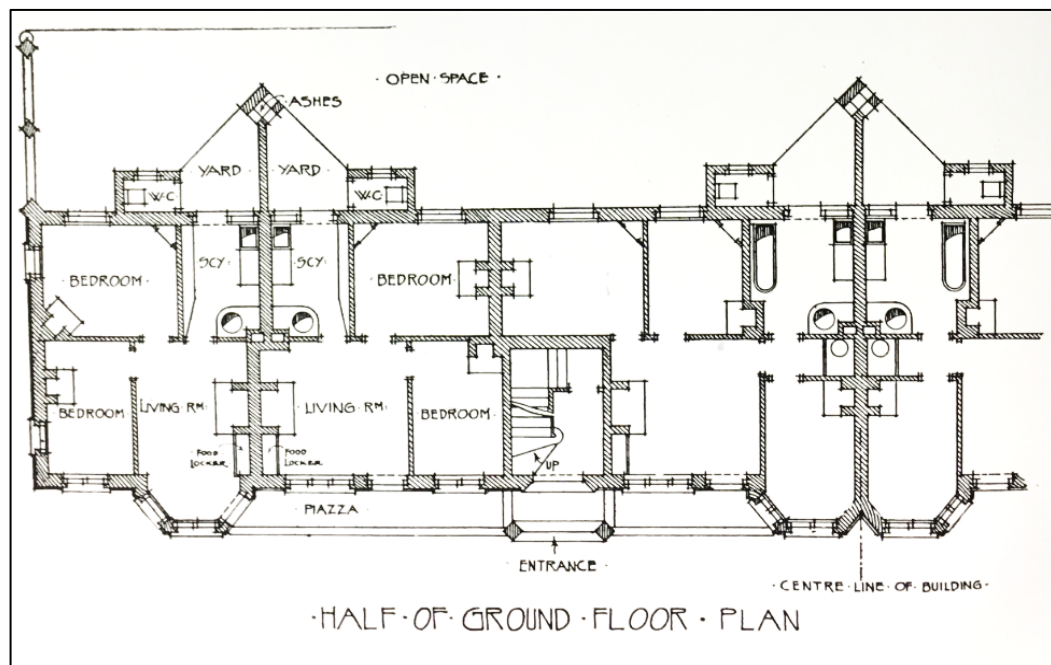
Original Plan of Eldon Grove c.1912⁵³
